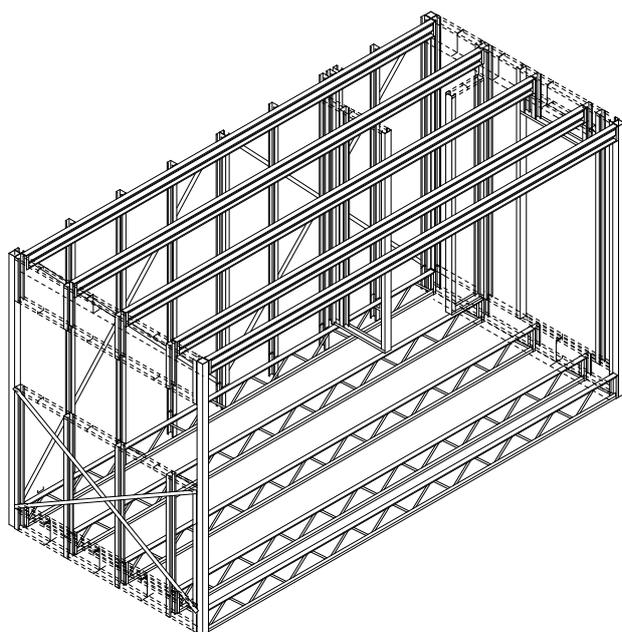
Structural components of open sided modules used in the roof-top extension at Plymouth
